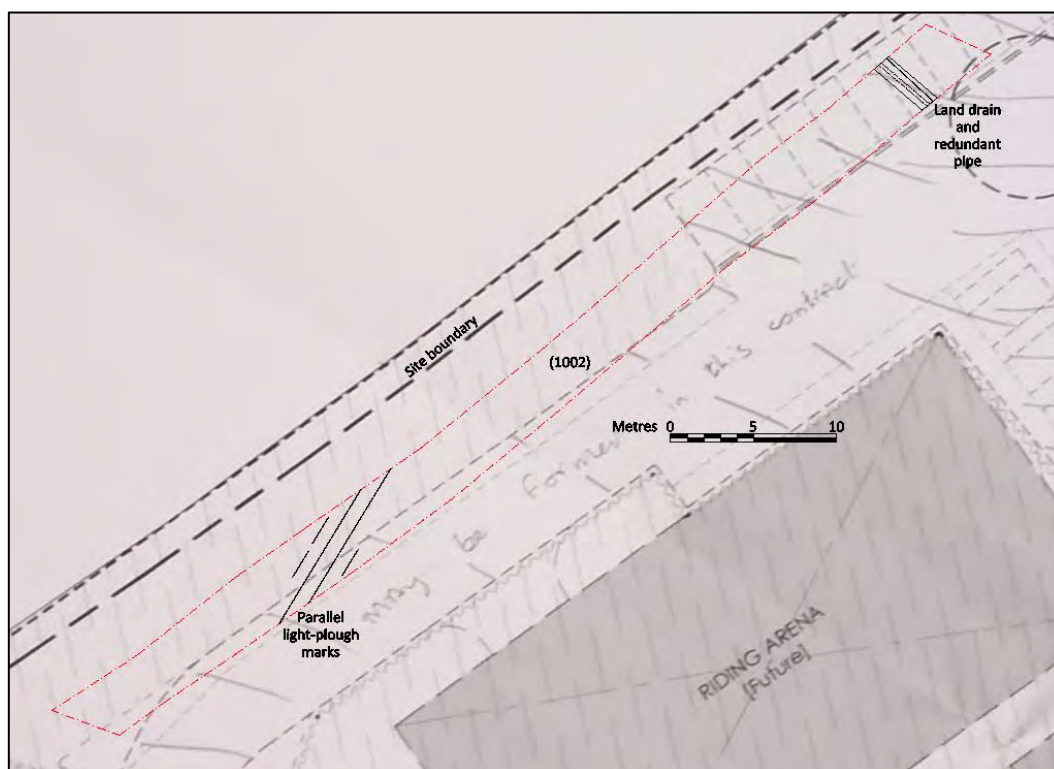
Plan showing location of access road strip in the field SW of main building complex. Scale: as shown.
